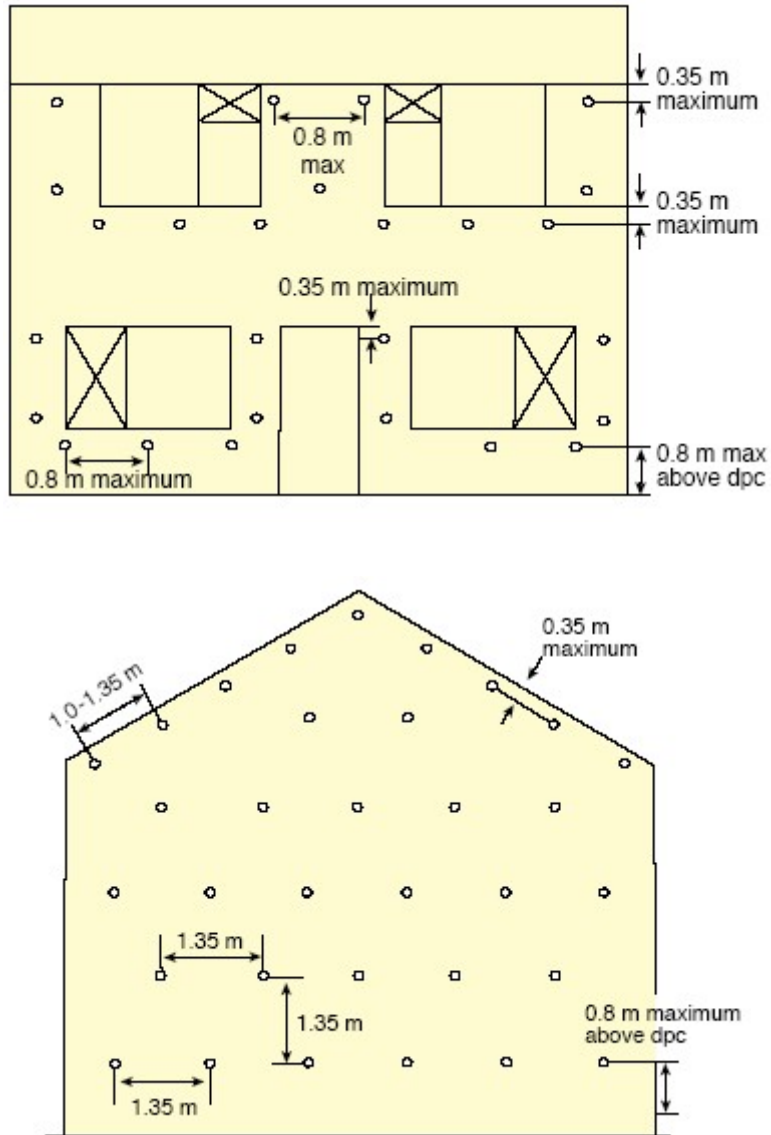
Typical Instafibre White Wool Hole Drilling Pattern in a Detached Dwelling
